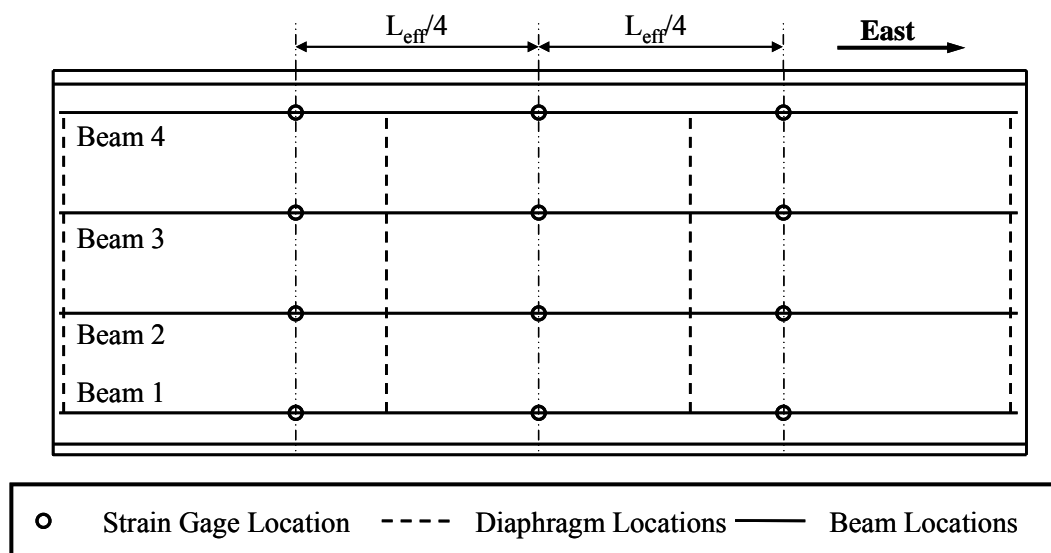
Instrumentation Plan for Willis Creek Load Tests
